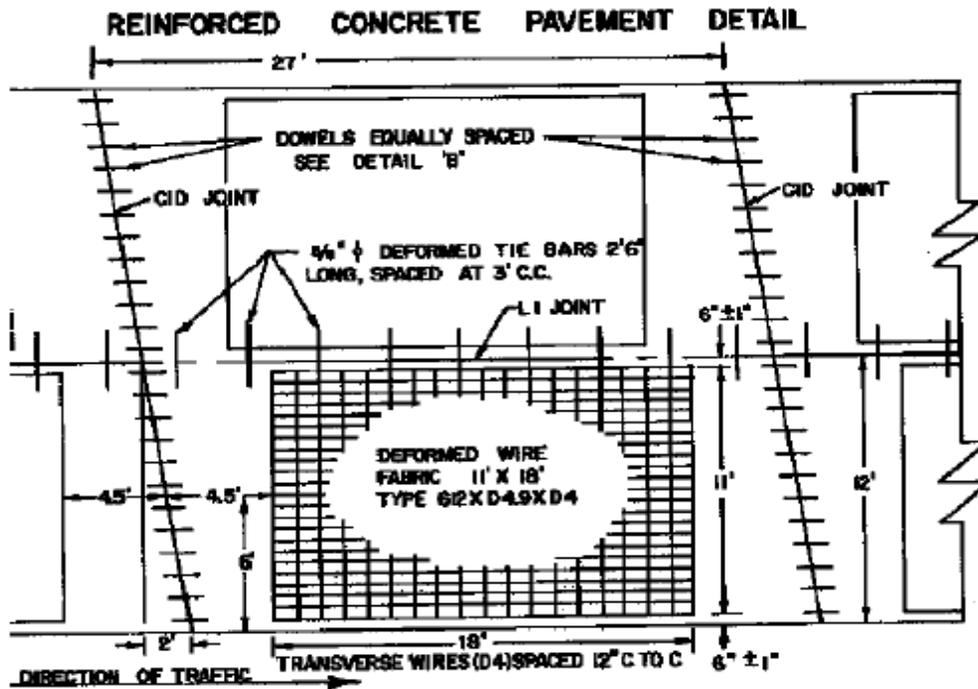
Reinforced Concrete Pavement Detail for 1972 TH 53 Project
